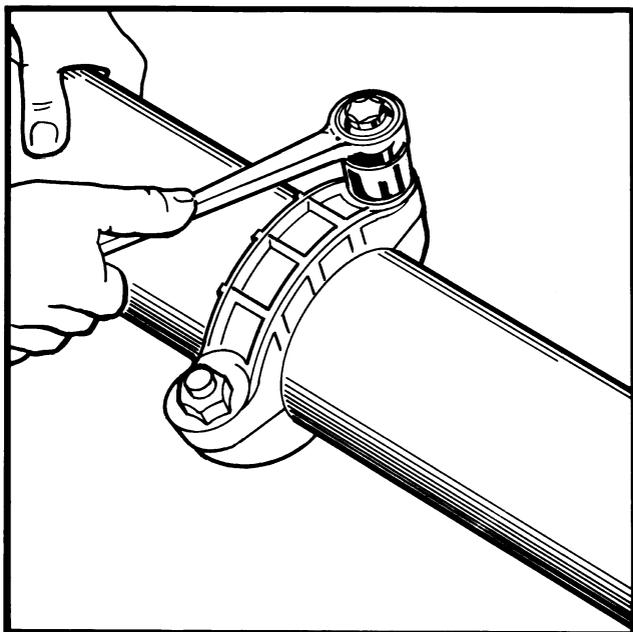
Installed Coupling Fastening Grooved Pipe Ends
